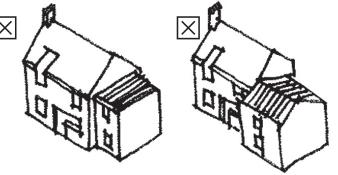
Flat roof on extension (left) does not sit well with the original ridged roof. Extension (right) is not subservient to, nor seamless with, the original dwelling. The extension also projects forward of the established building line
